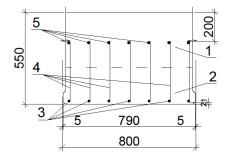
Construction and reinforcement of a slab (its width is 800 mm):
